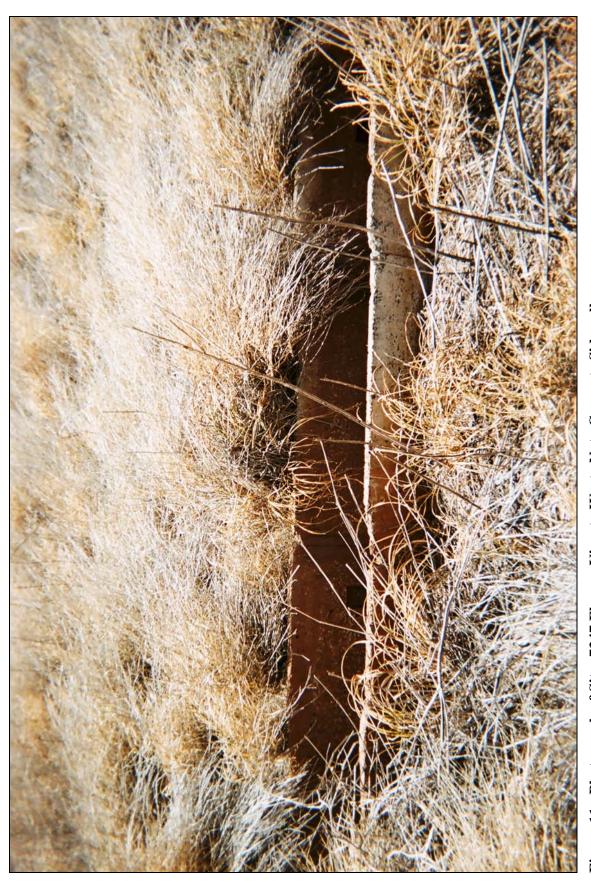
Photograph of Site -7347 Flume. View to West. Note Concrete Sidewalls.
